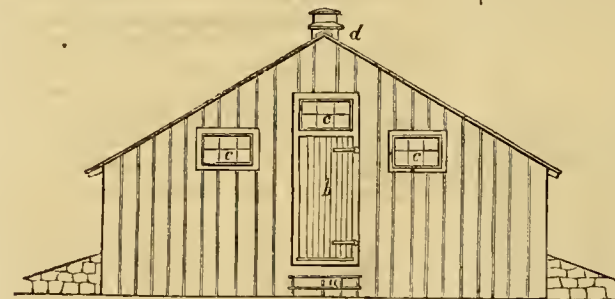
FRONT ELEVATION OF PIGGERY.
